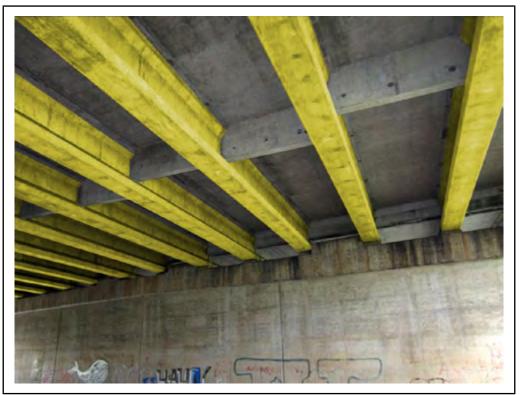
Prestressed Concrete Open Girder / Beam (Highlighted)
